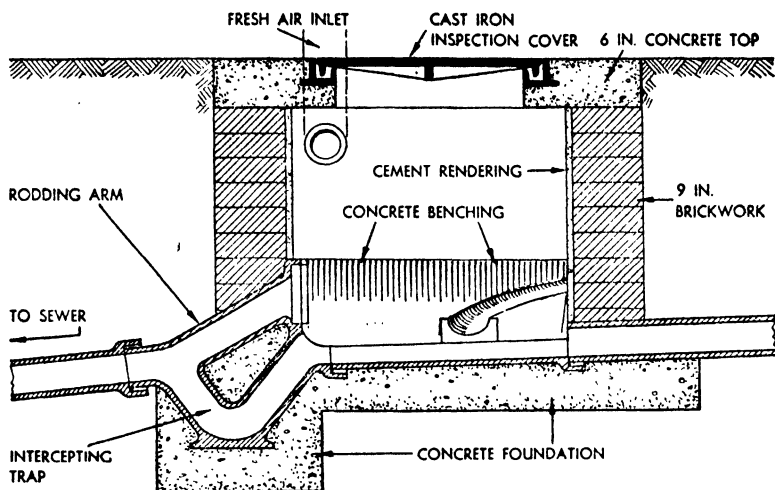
Section through an interception trap and inspection chamber. The inspection arm rises from the sewer side of the drain, thus enabling the road section of the drain to be inspected and any obstruction removed by means of rodding.
